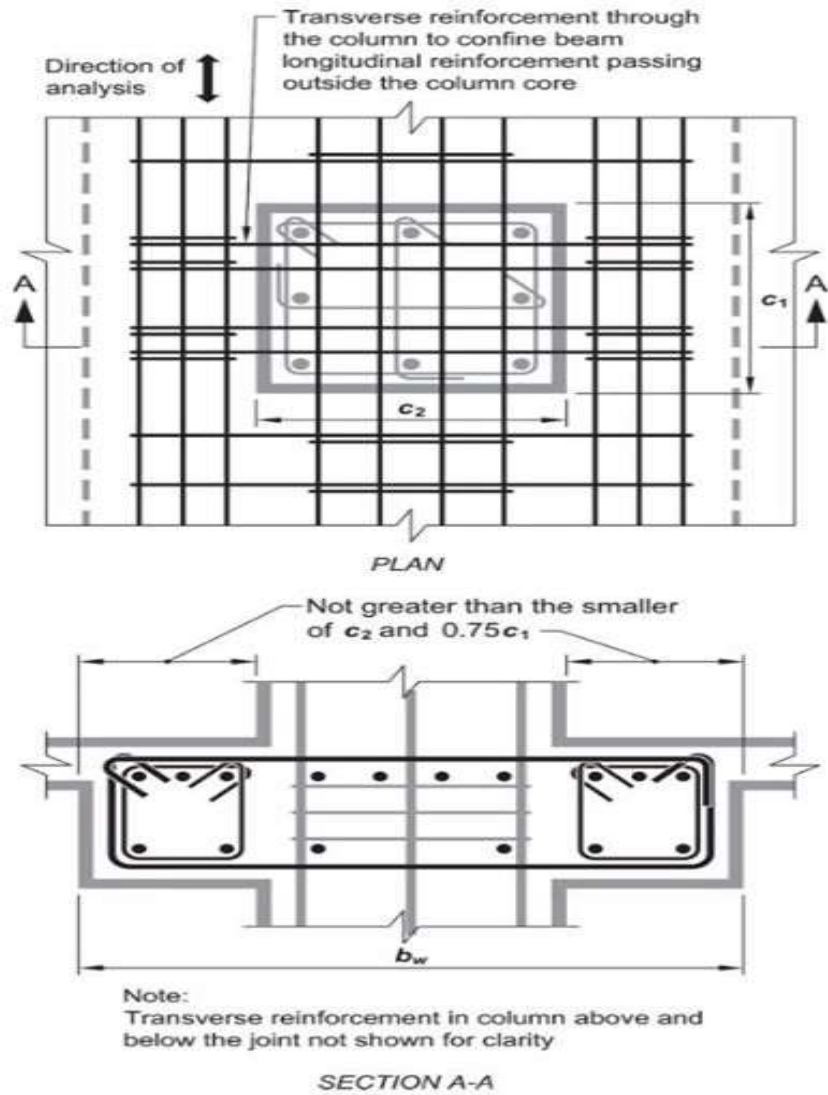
Maximum effective width of wide beam and required transverse reinforcement.
